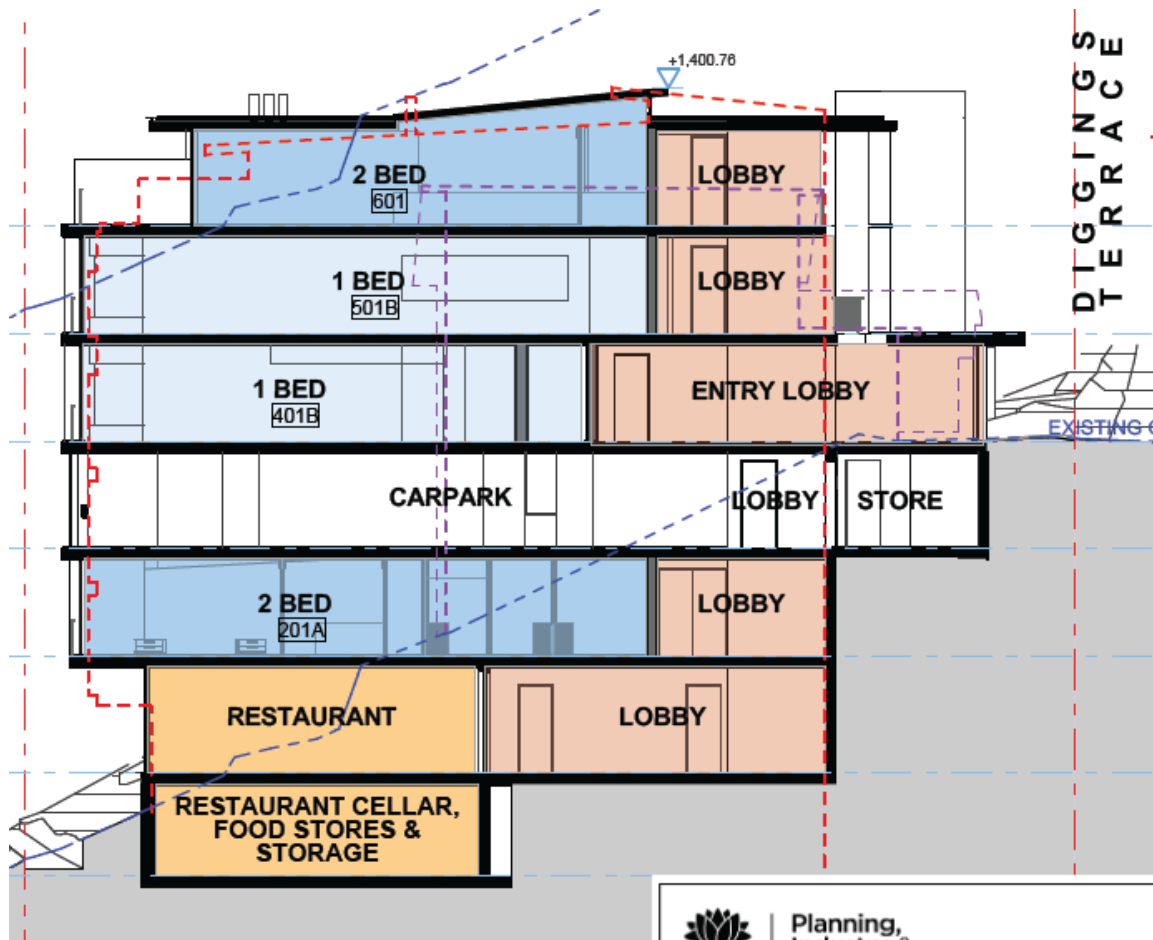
Section looking east (extracted from Popov Bass Architectural Drawings)
